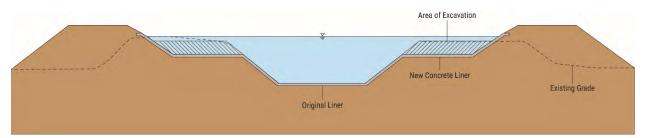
Compound Trapezoidal Cross Section in the Parallel Canal Alternative
